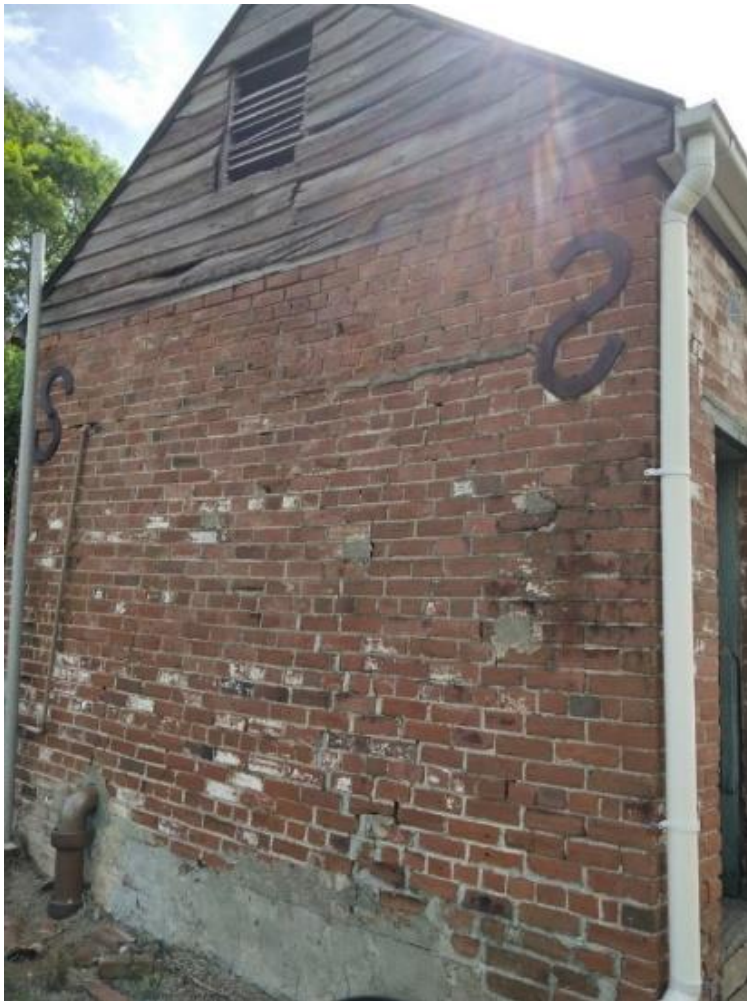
The western elevation of the servants' quarters outbuilding. Note the cement-based repair work. Do *not* employ this method of repair in future. Where possible without inflicting further structural damage, reverse where it has occurred by raking out joints and repointing with lime mortar.
